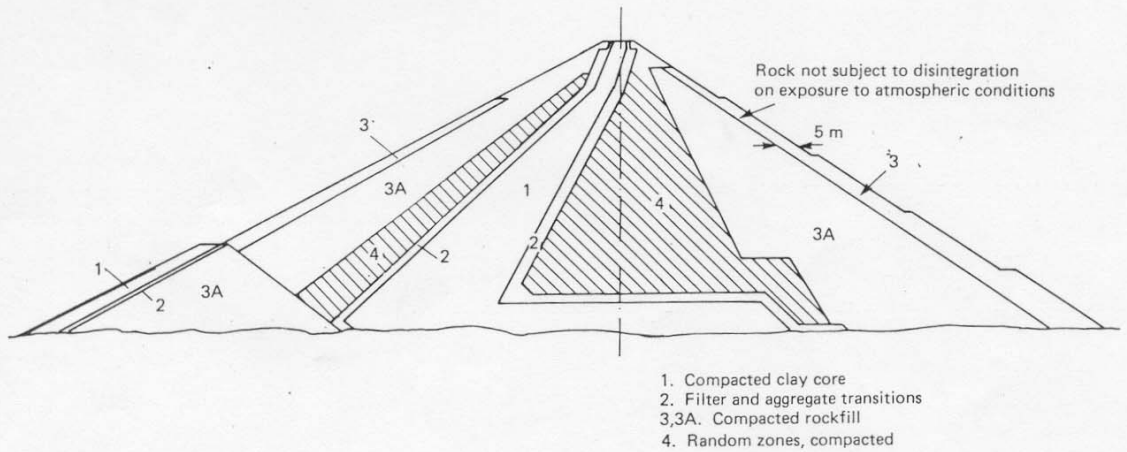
Typical detailed cross-section of zoned earth-rock dam indicating zones of selective materials (see Table 44.2)
